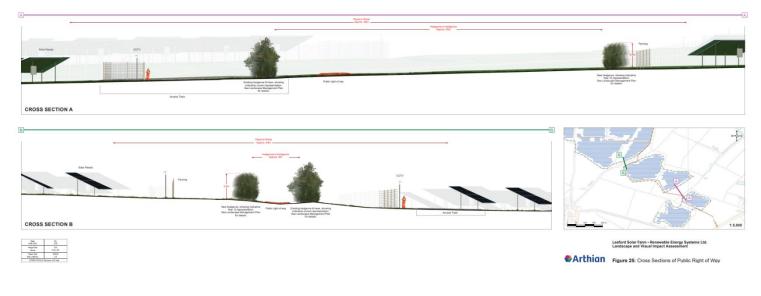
below and Appendix J portrays the cross-section drawings of the 2x Public Rights of Way crossing the Application Site boundary.
